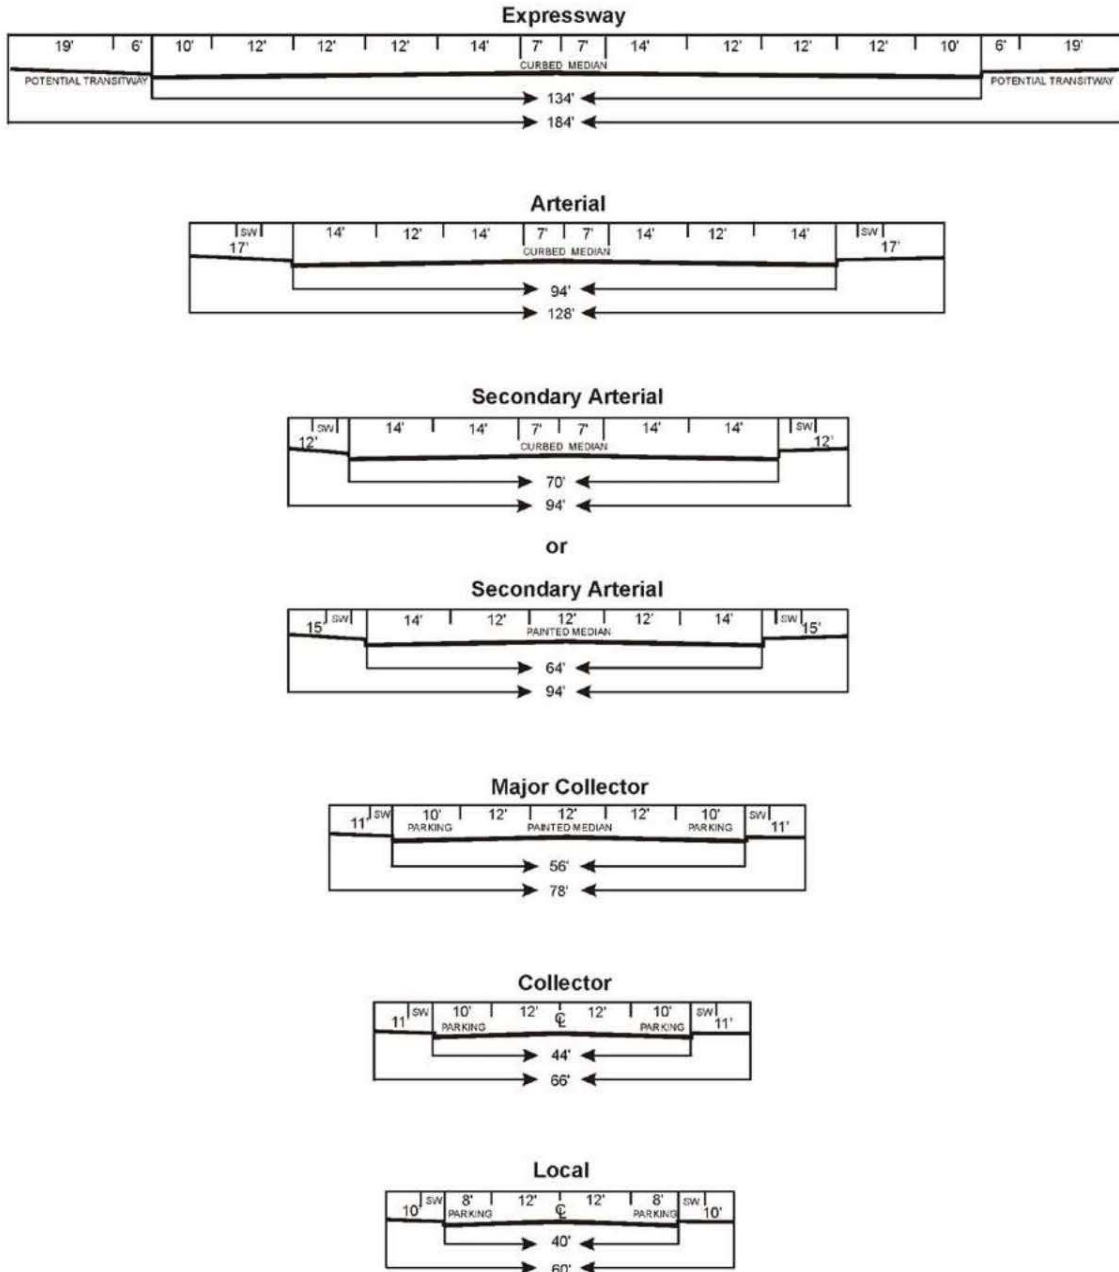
CITY OF PERRIS GENERAL PLAN ROADWAY CROSS-SECTIONS
